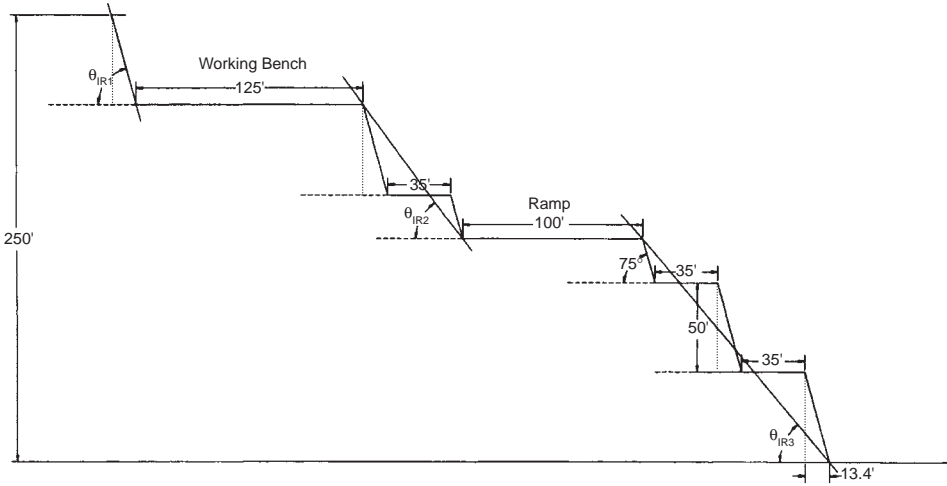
Interramp slope angles for a slope containing a working bench and a ramp.
